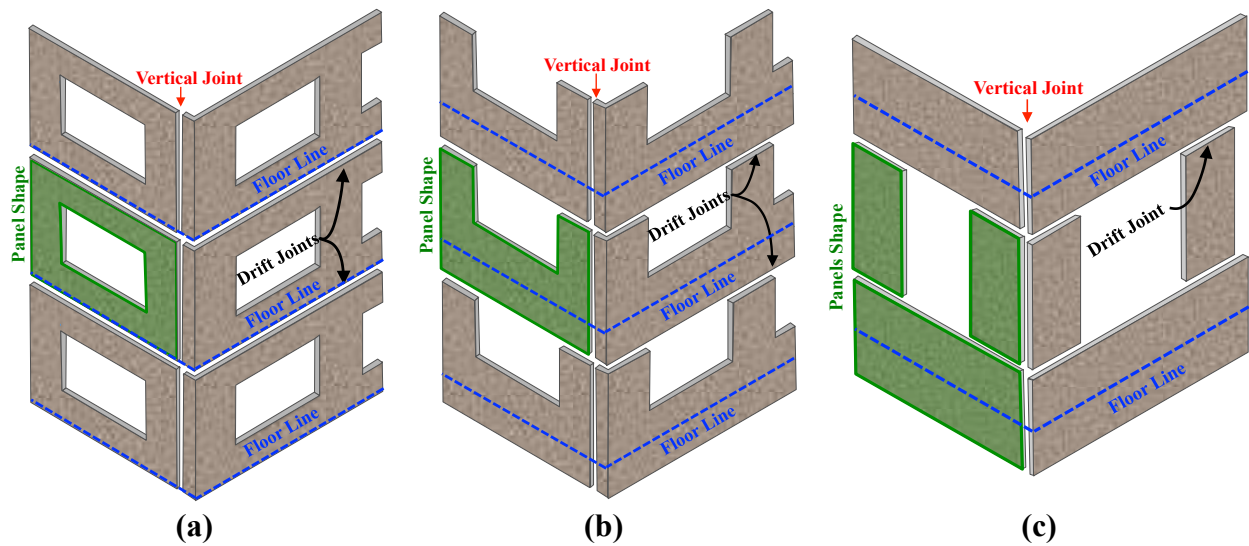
Subset of common APC cladding arrangements for building façades: (a) punched window panels, (b) u-shaped panels, and (c) emulated u-shaped panels (also referred to as spandrel with column cover panels). These drift-compatible systems are the intended focus of this guide.
